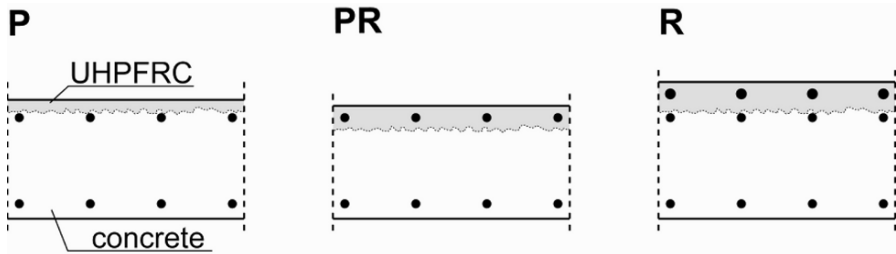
Basic configurations for composite structural elements combining UHPFRC and conventional structural concrete
